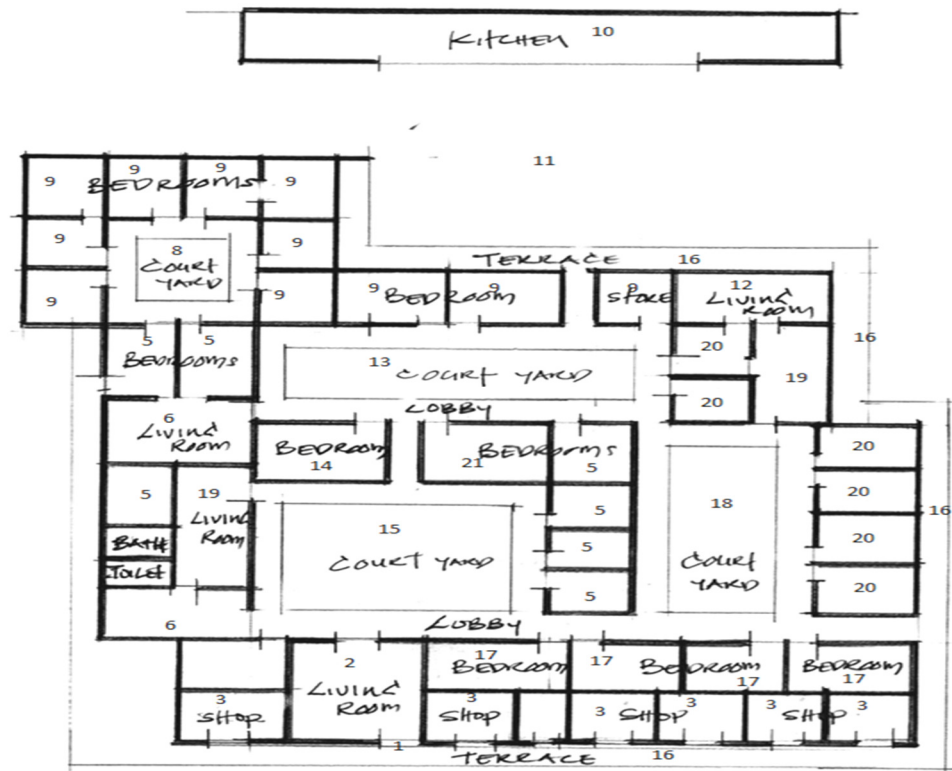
Floor Plan of a Typical Family Compound Courtyard House (Source: Ekhaese 2011)
